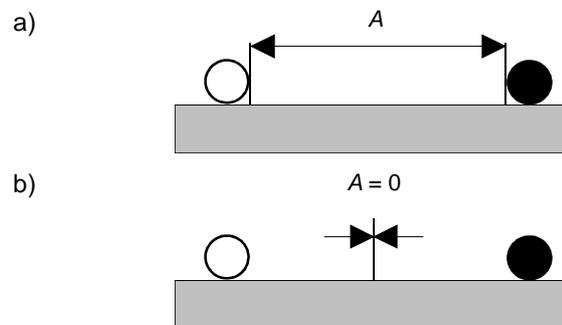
Examples of power cables and information technology cables that run parallel without divider
